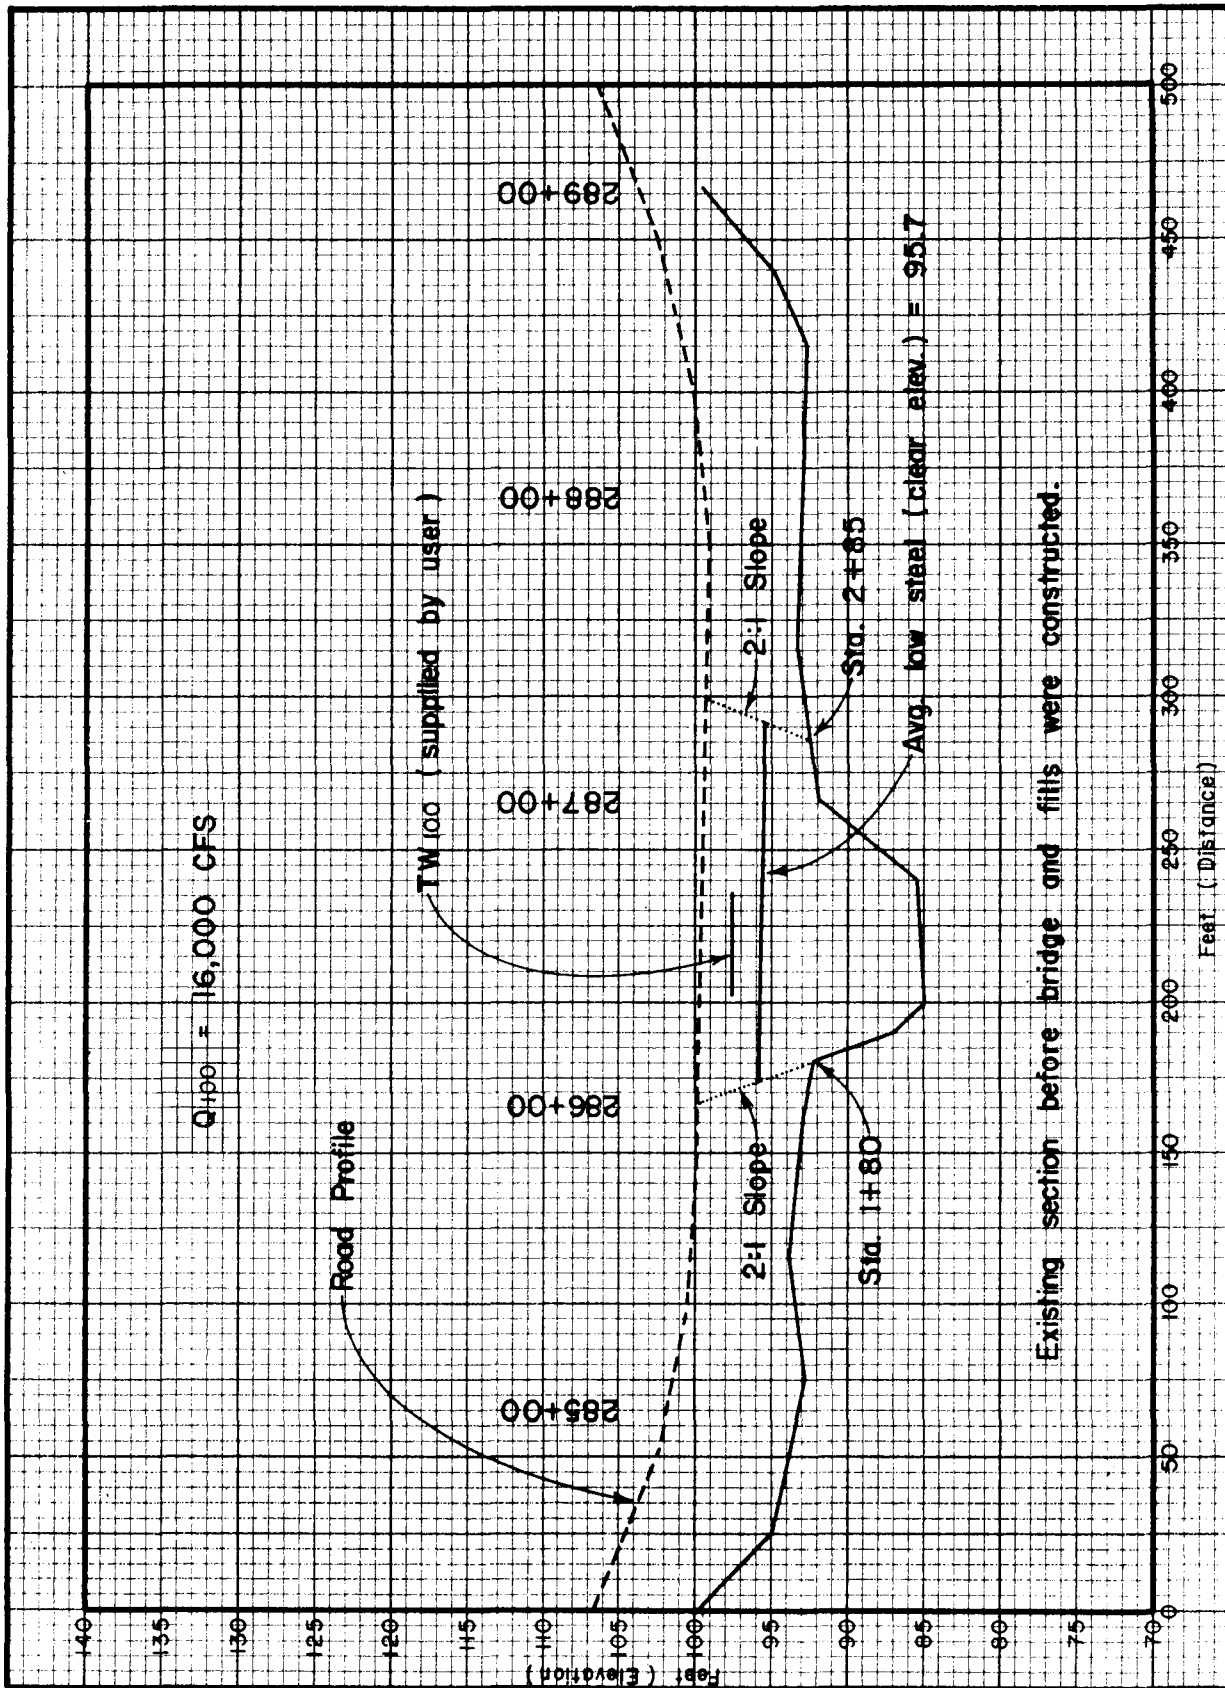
CROSS-SECTION AT BRIDGE SITE
